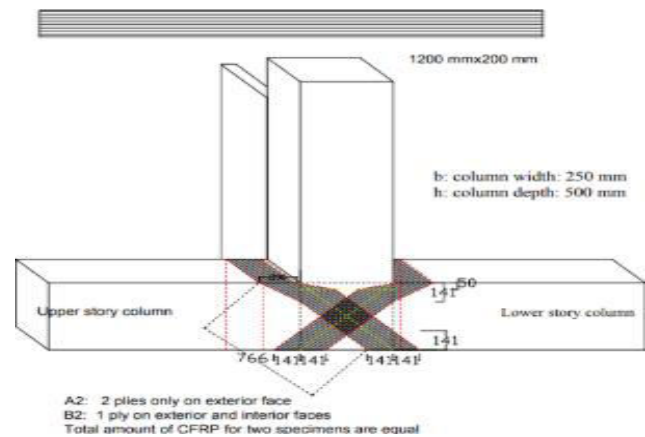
Retrofitting scheme of a specimen A2 (dimensions in mm) [21].
